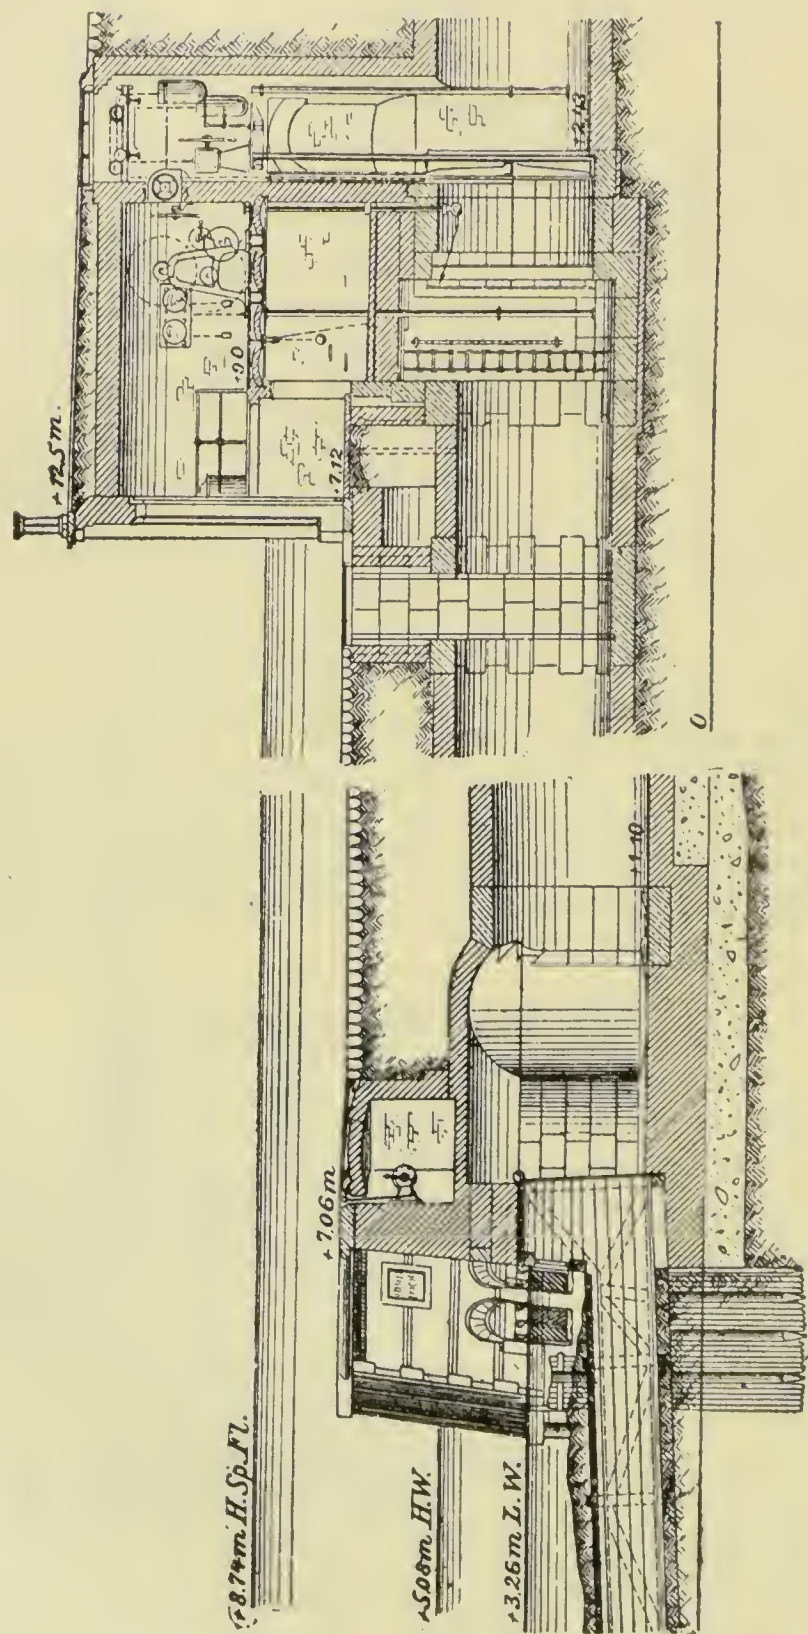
OUTLET IN HAMBURG. - ELEVATIONS IN METERS.
